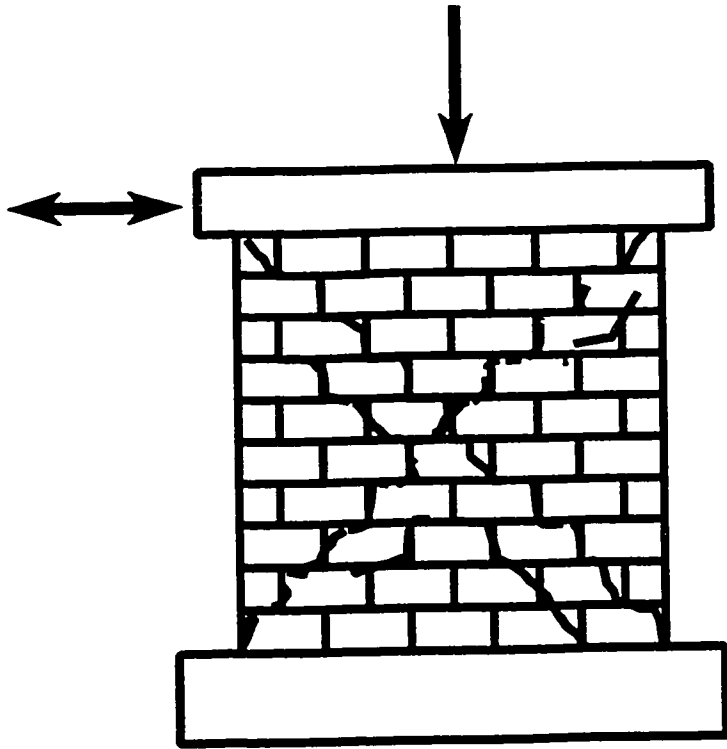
Diagonal tension failure in low-rise masonry walls
